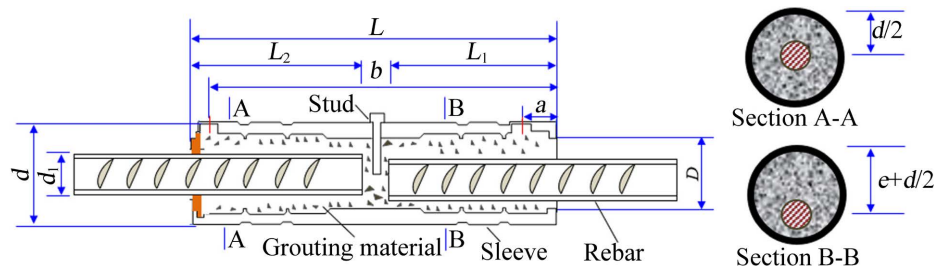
Test sample for corrosion grouting sleeve connection
